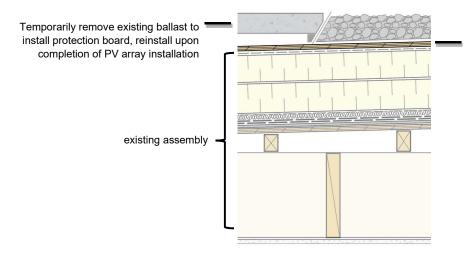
PV Array & Equipment Protection - Built-up Roof (BUR) Assembly
